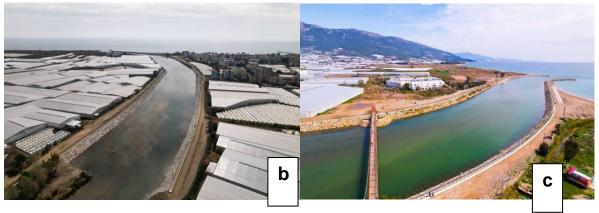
4c) The stone wall built alongside the Dragon Rivulet (Ref: Website of the State Hydraulic Works (DSI) institution https://www.dsi.gov.tr/Galeri/ResimgaleriDetay/4488- © State Hydraulic Works (DSI) institution – 2023)
